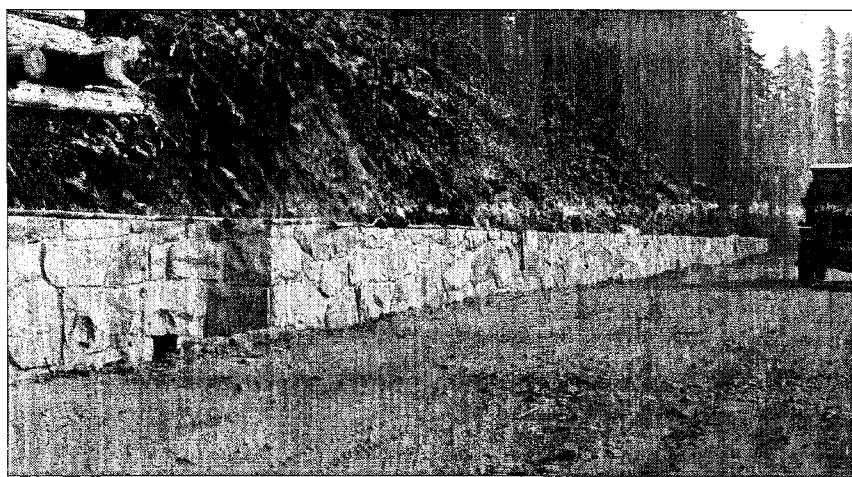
Historic photo showing retaining wall near Inspiration Point, 1930 (MORA Archive).
